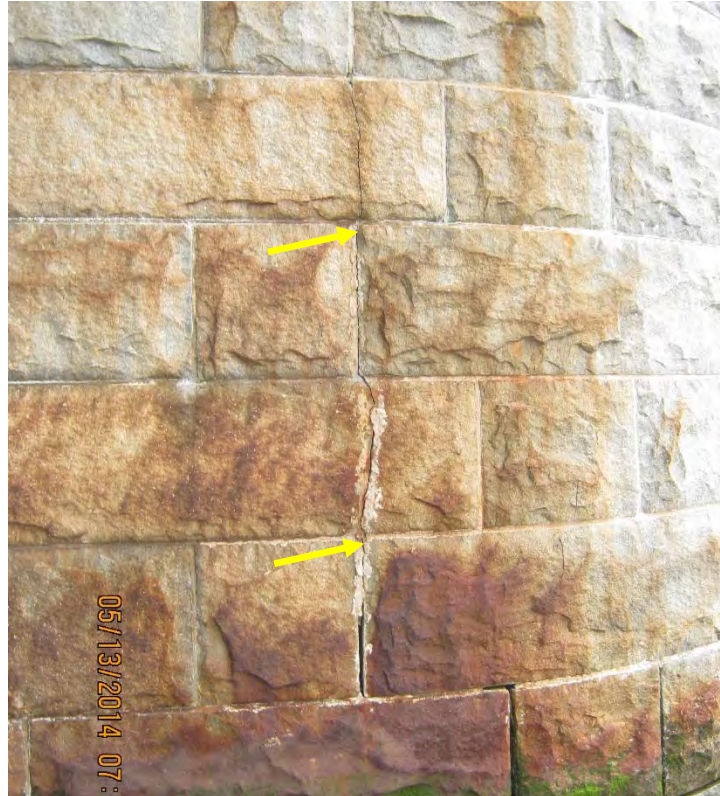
Pier 7, cracks in granite blocks above water line.
